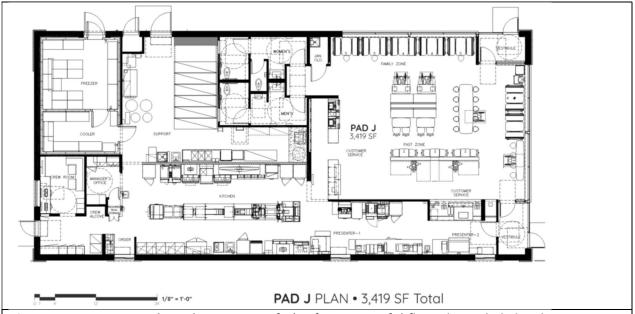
4,045 Sq. Ft. Floor Plan: 4,045 sq. ft. (42 ft.-7 in. x 95 ft.) floor plan included in the January 21, 2025 resubmittal (and incorrectly labeled 3,419 sq. ft.). Exterior dimensions are not provided (as required on Plan Set Checklist) so dimensions were obtained by measuring using provided scale.
